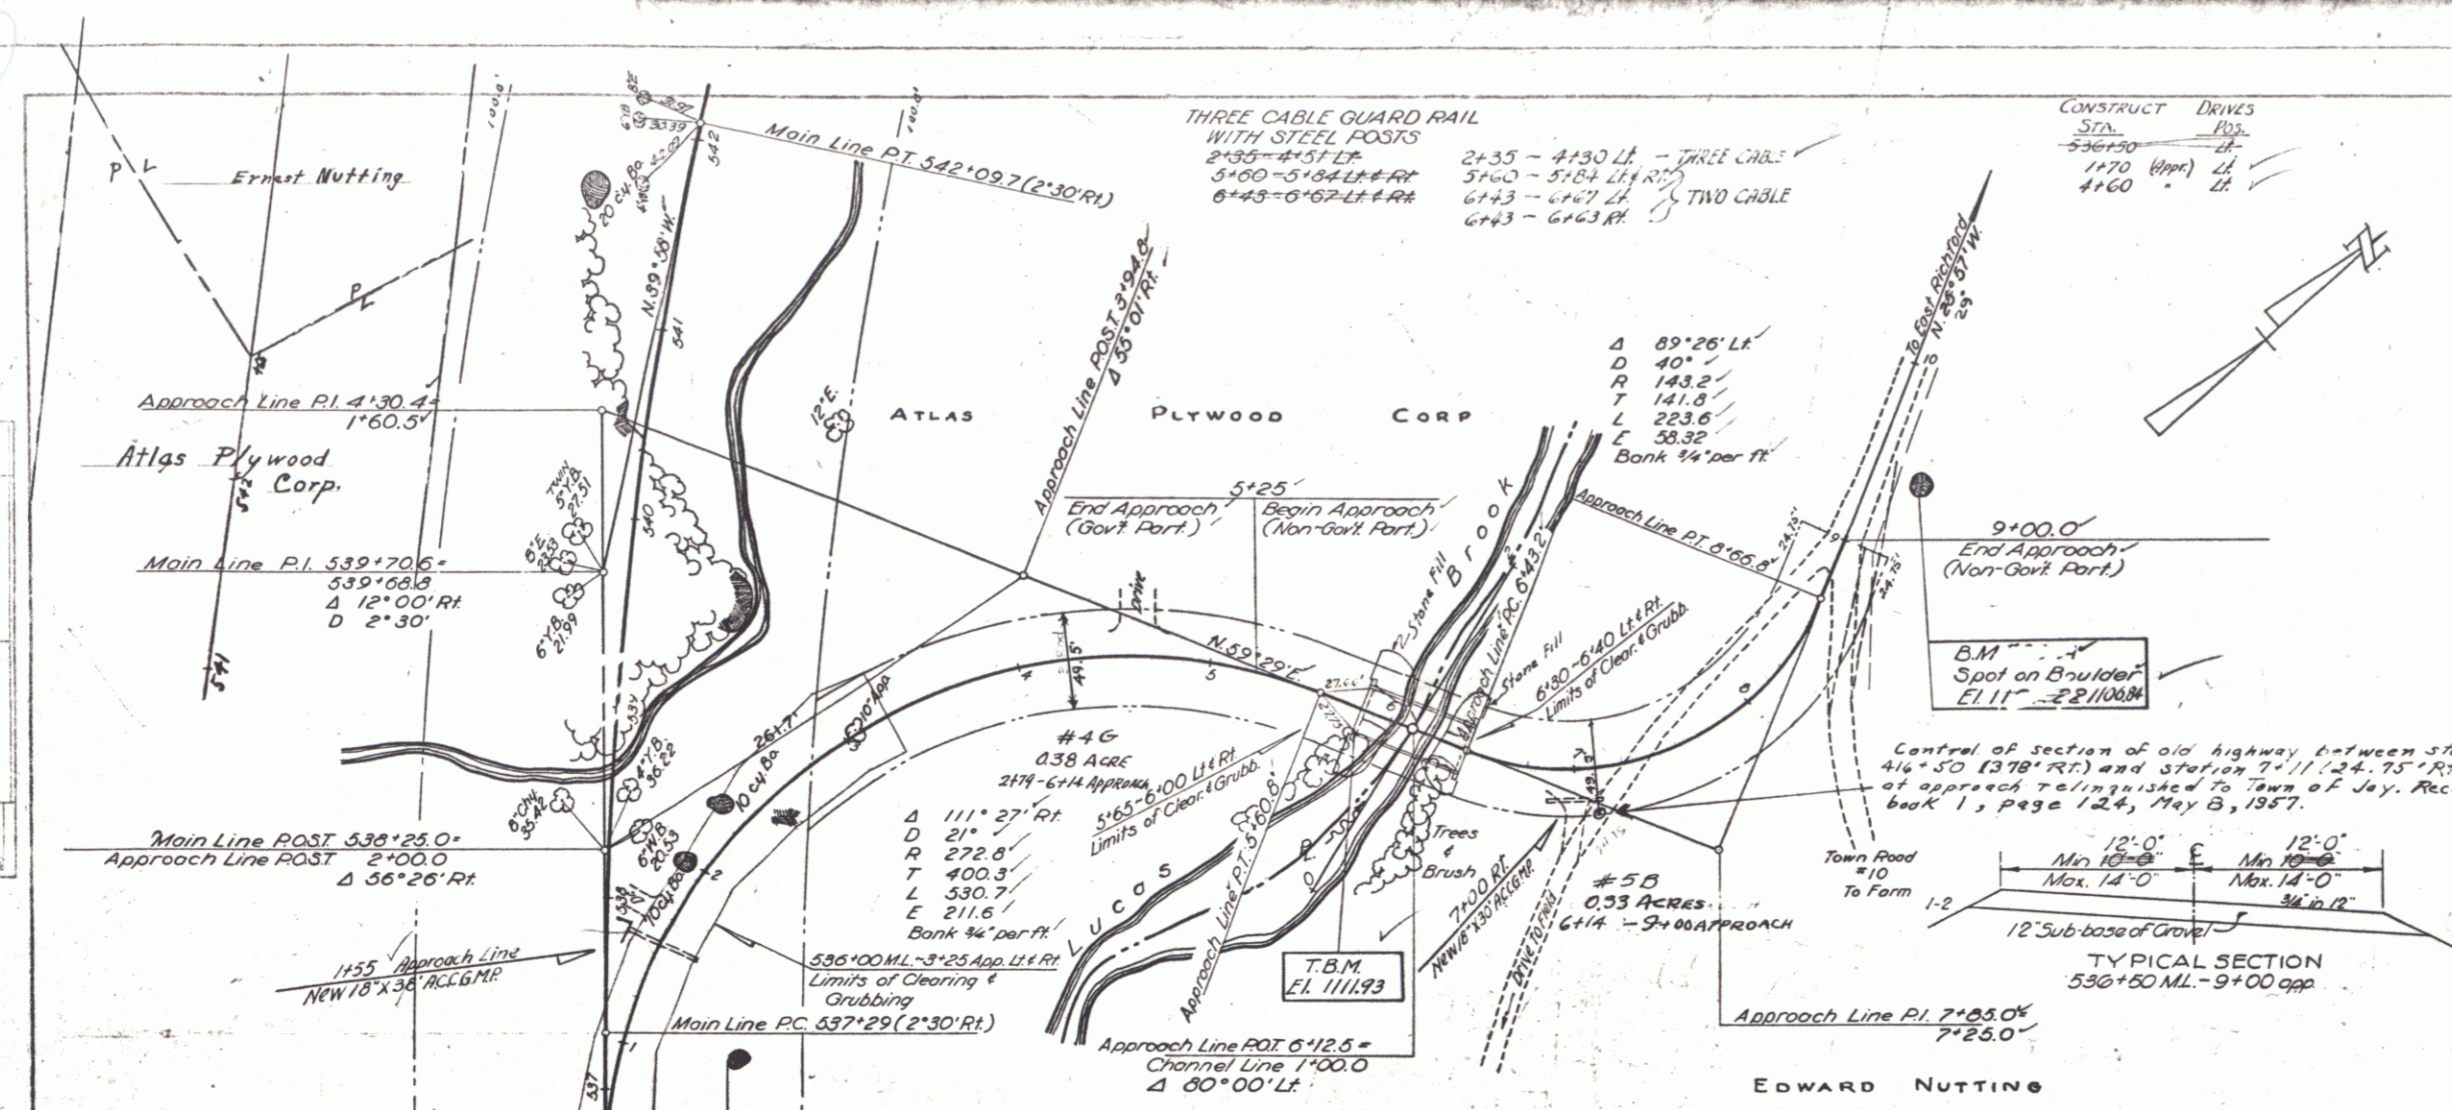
PLAN & PROFILE OF ROAD STATIONING
